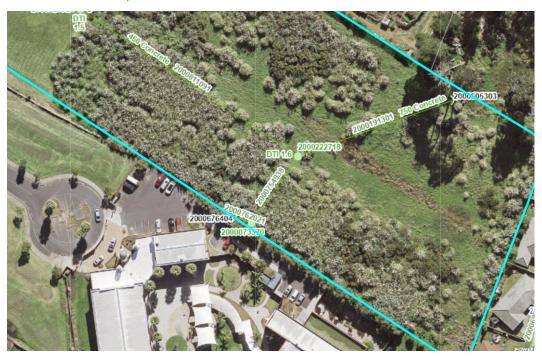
Existing Public Stormwater Drainage (22 Westney Rd)
